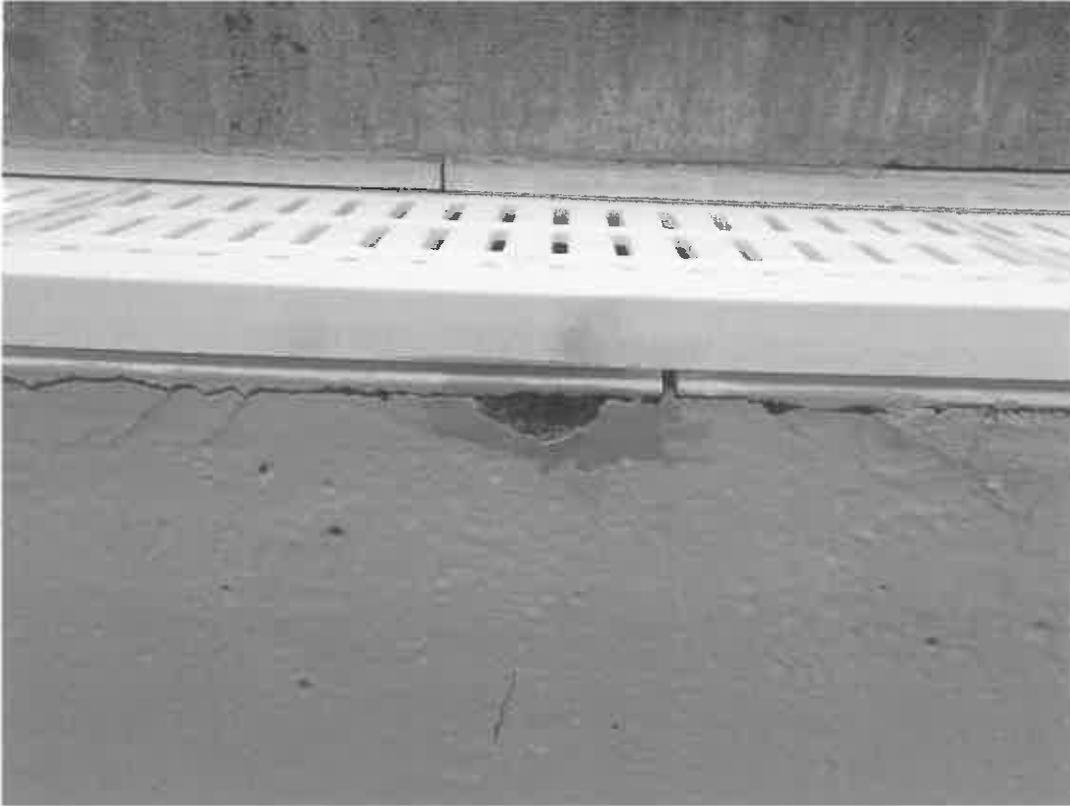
Deteriorated Grout at Trough Below Plastic Cover
